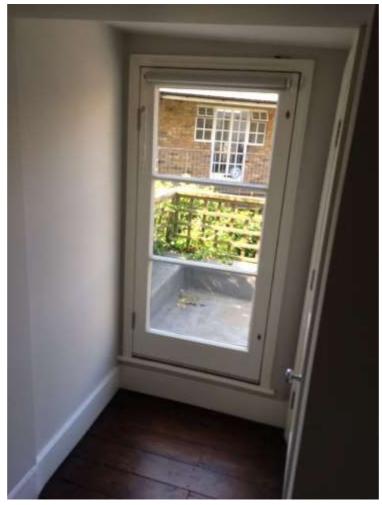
5 Sharpleshall Street. Modern door in the rear of the closet wing at first floor level.
